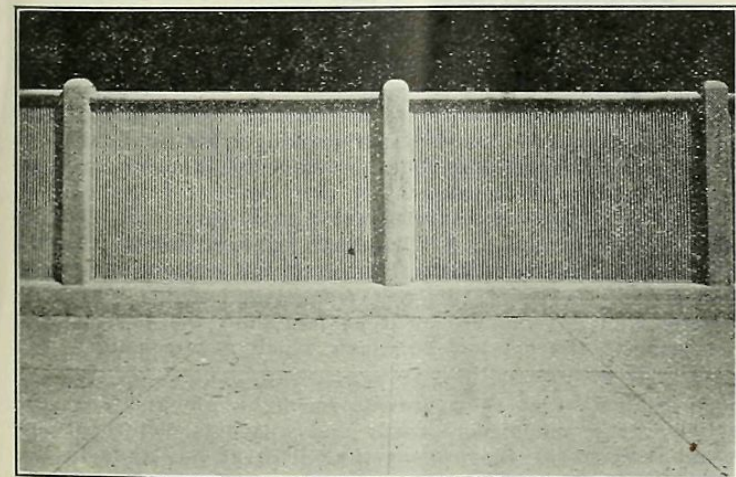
DETAIL OF CONCRETE FENCE, WITH CORRUGATED SURFACE.
